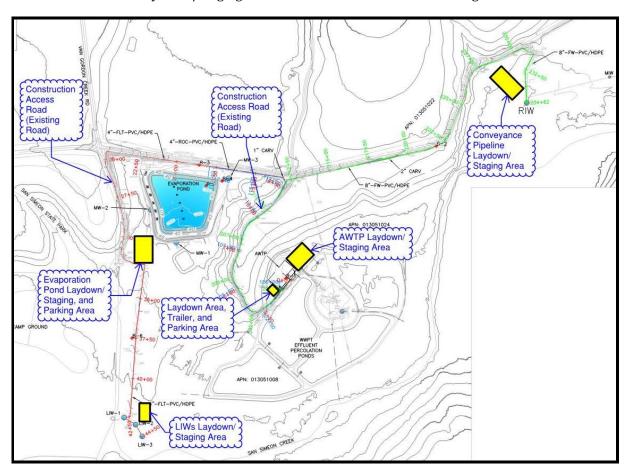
Construction Access Road and Laydown/Staging Areas
